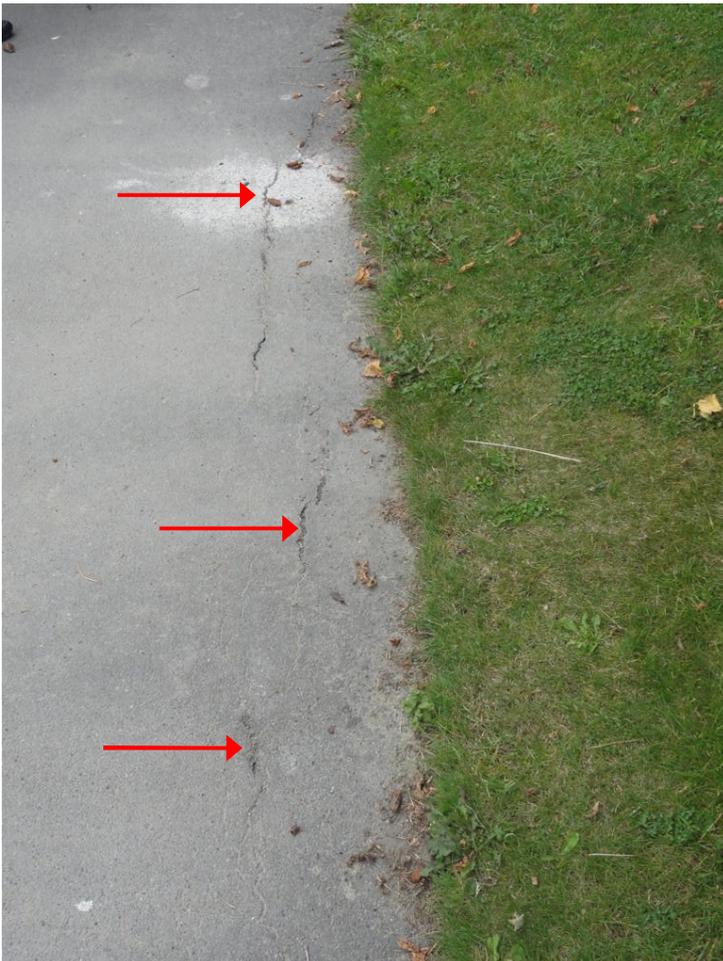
Possible earthquake induced cracks in asphalt.
